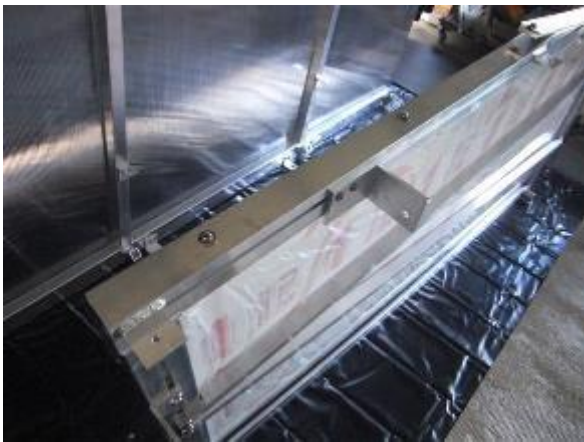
Fix flat aluminium bars 50x2mm with pan head tapping screws DIN 7981 6.3x38 and washers DIN 9021 Ø 7.4mm.
